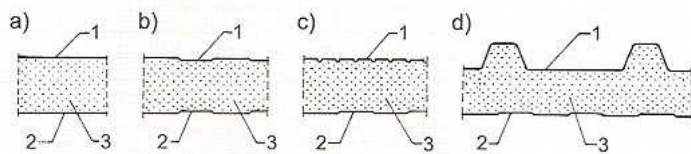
Examples of laminated panels: 1- external lining, 2- internal lining, 3- insulation
